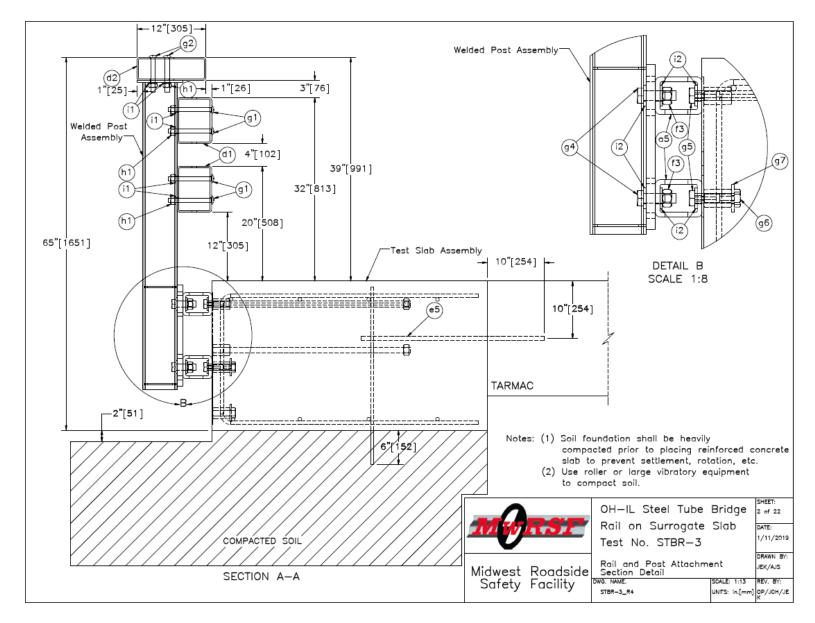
Rail and Post Attachment Section Detail, Test No. STBR-3
